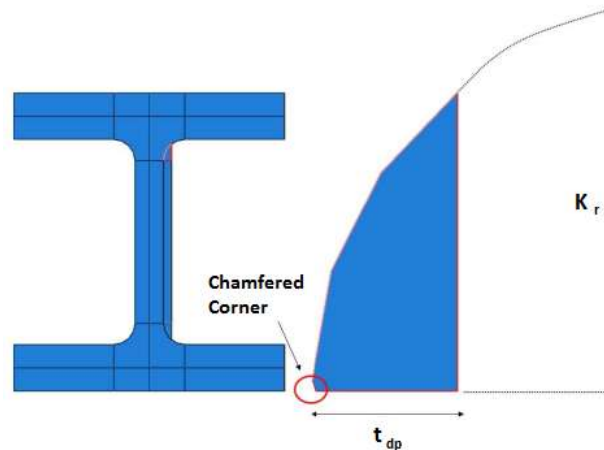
Vertical groove welds between the DP and the column flanges
